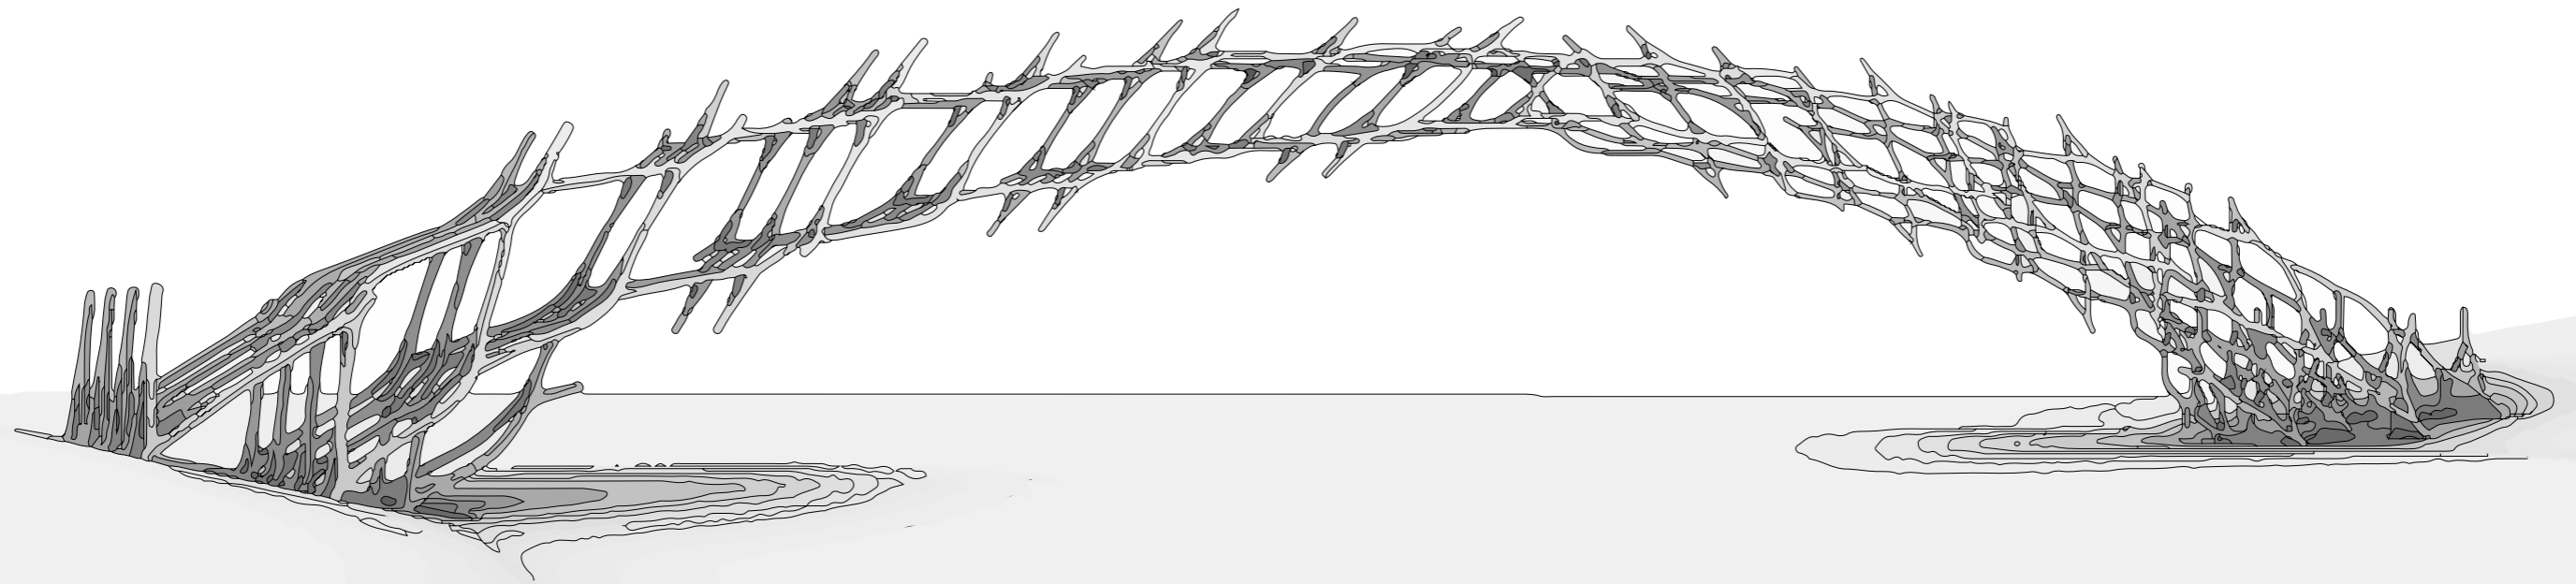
Bridge Assembled from Forked Branches Spanning Over the Quarry Lake | Nolan | 2023
